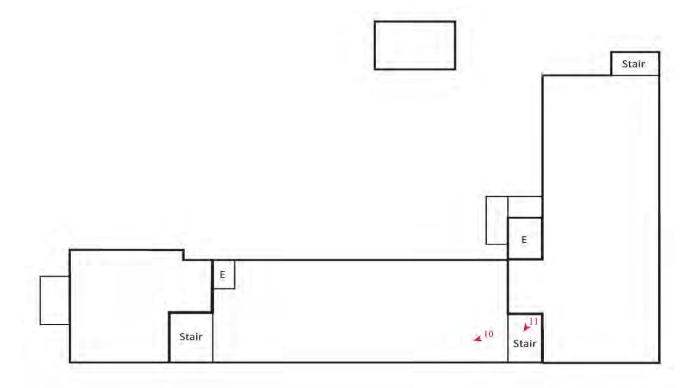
Current Second Floor Plan with Photo Key, 2024. Source: Ryan LLC, 2024.
